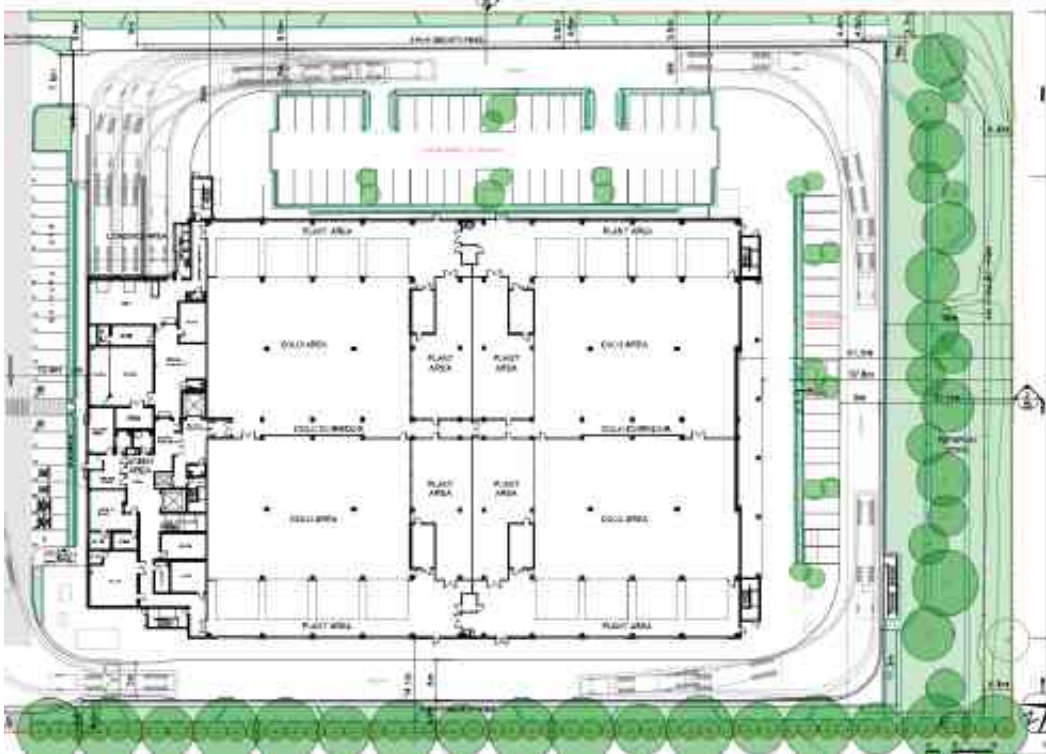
Concept plan demonstrating potential for additional parking to be provided
